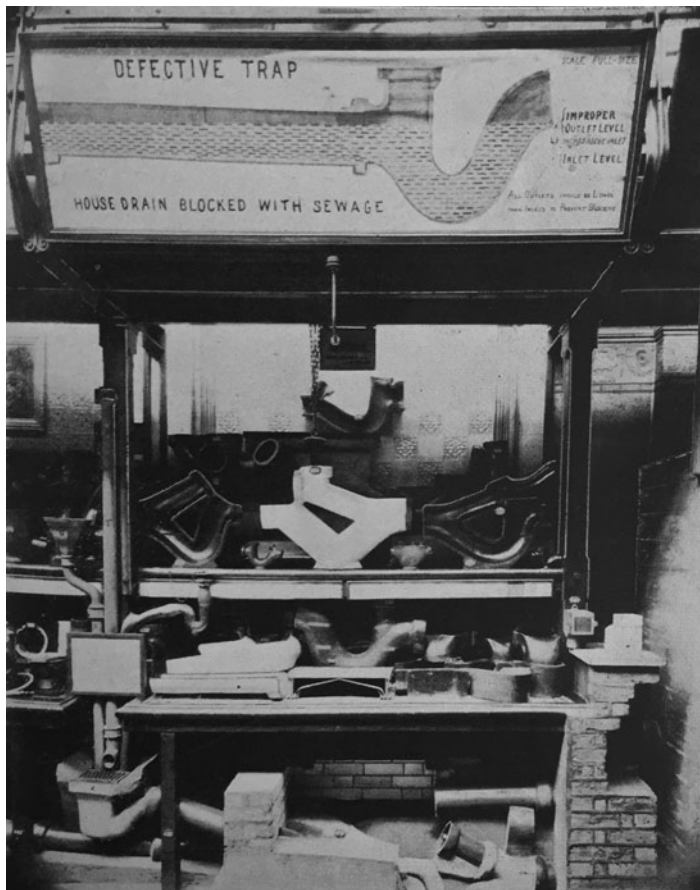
Exhibits on house drainage and disconnecting traps, showing the construction of a manhole with the arrangement of drainage for the soil pipe, baths, lavatory and rainwater pipes, Margaret Street, undated. The Sanitary Institute, op. cit.
